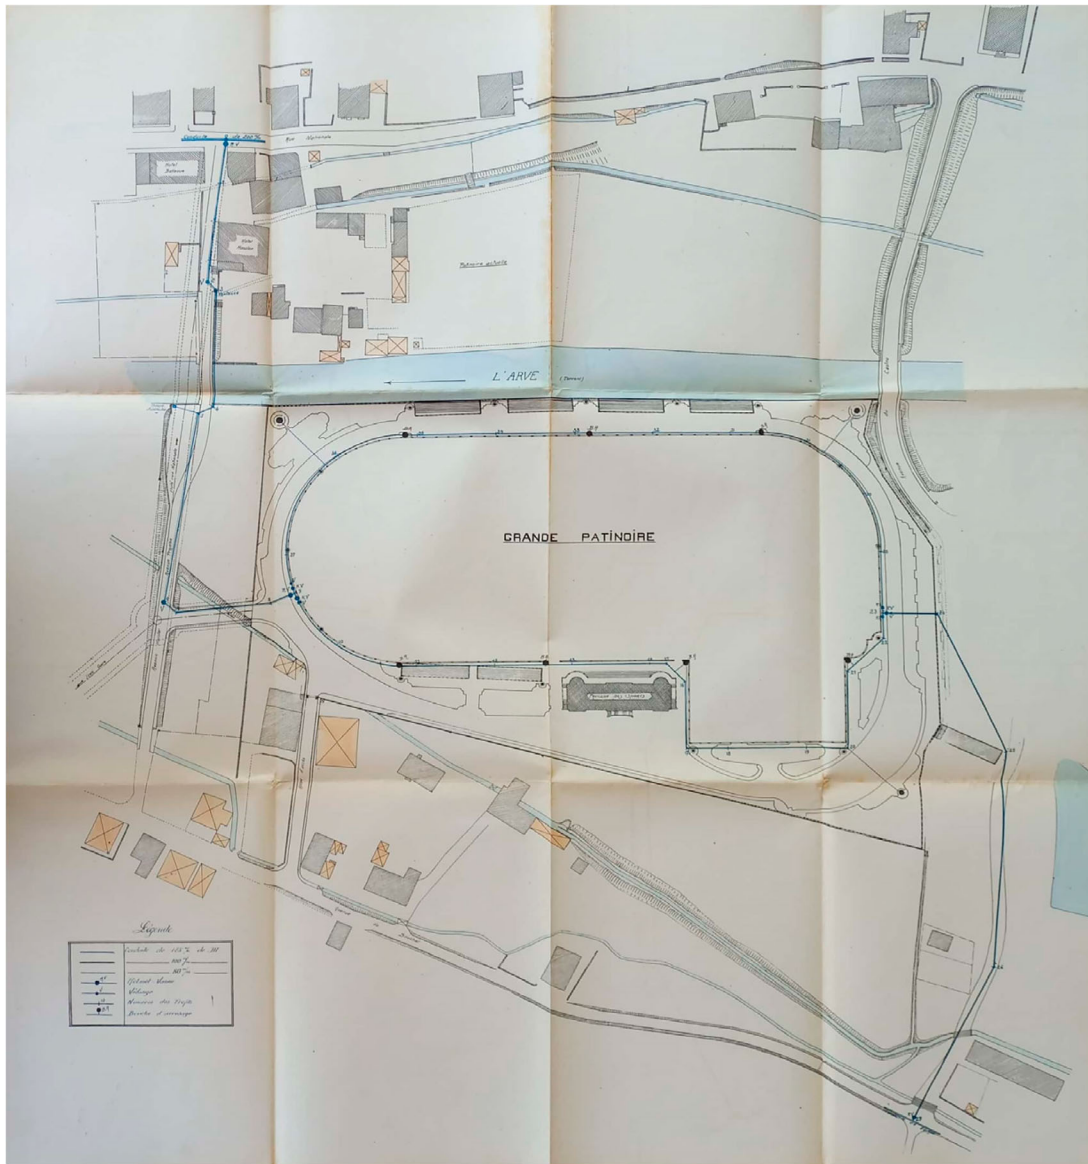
Ice rink. Drinking water distribution. General plan of the pipelines. 06/04/1923, 20 2181, Arch. dép. Haute-Savoie.
